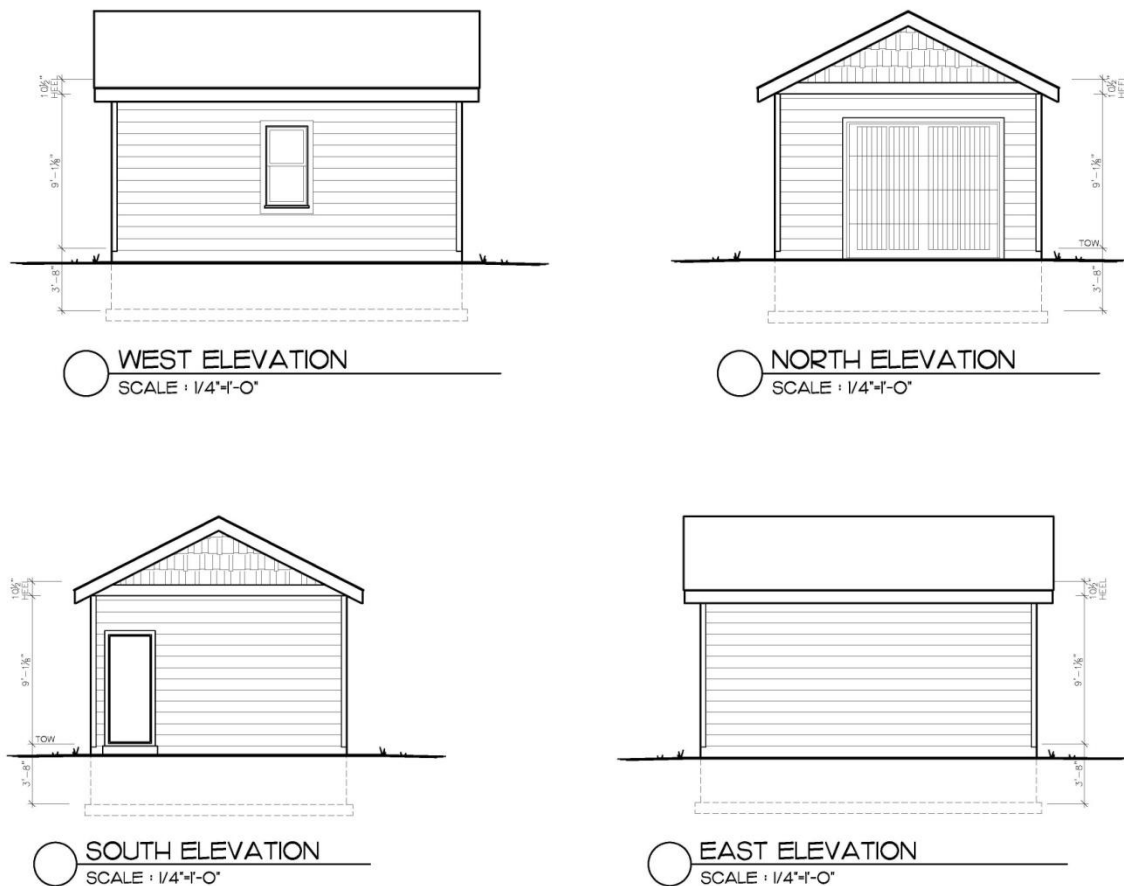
Elevations of proposed garage, Dec. 3<sup>rd</sup>, 2014.
